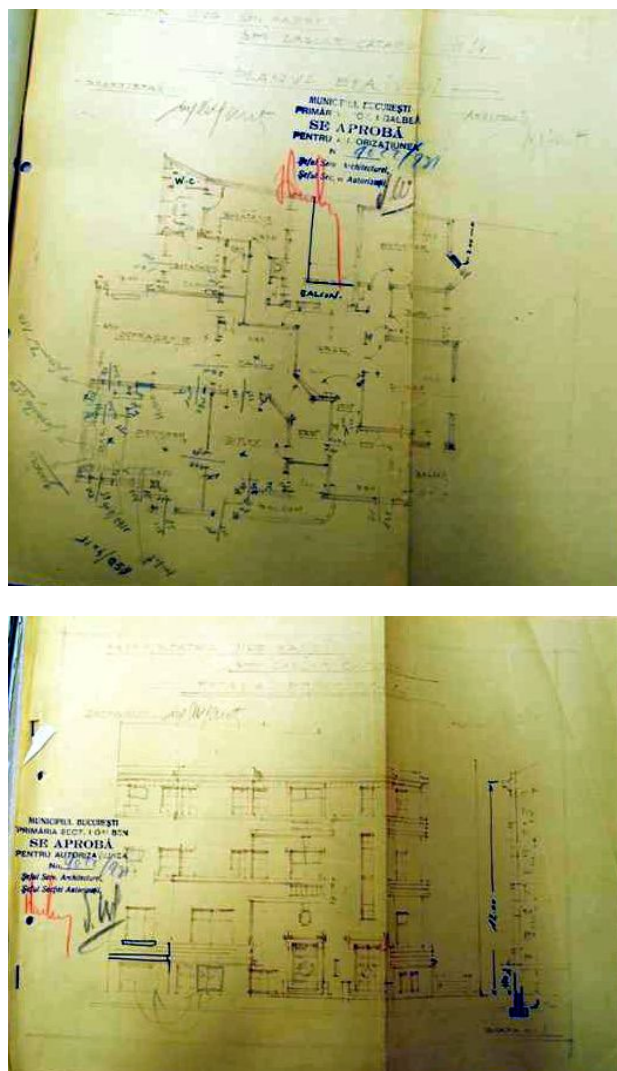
Family Haret house (1931), Photo: Maria Boștenaru-Dan, 2011. Archive plan and facade (above): Town hall of Bucharest city (PMB fond tehnic).
